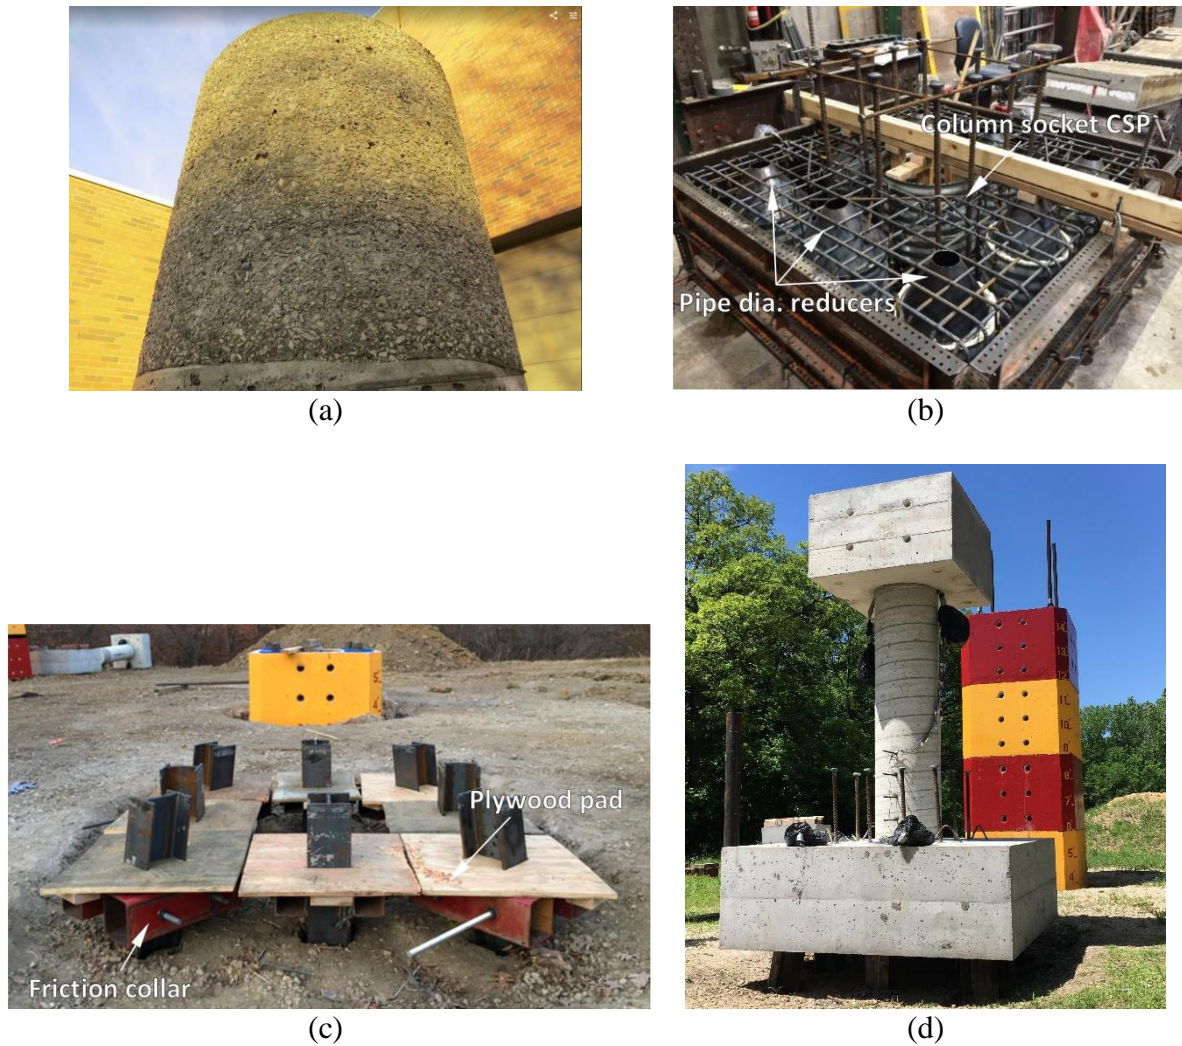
Test unit construction: (a) roughened surface of column end, (b) pile cap prior to concrete pour, (c) driven piles, and (d) completed test unit
